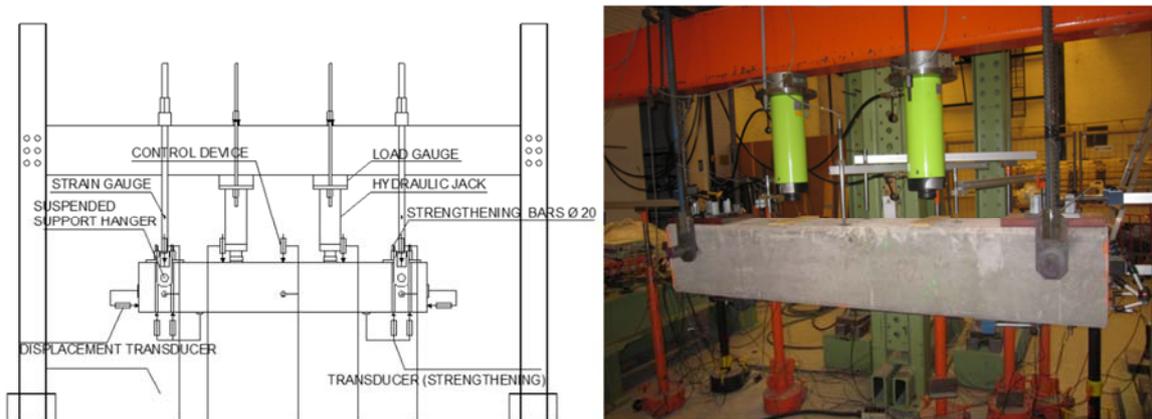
Photo and drawing of the indirectly supported four-point bending test.
